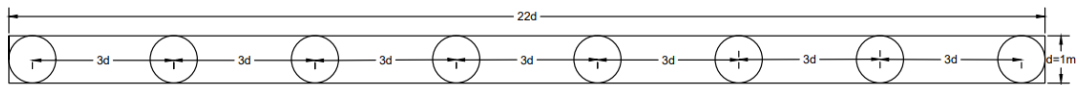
8 pile arrangement with 22 sqm. Raft size
